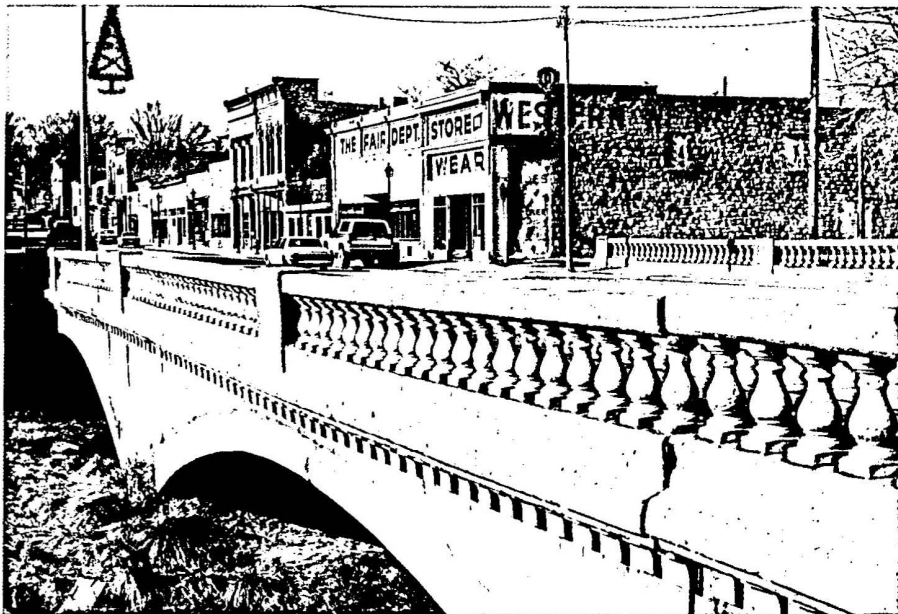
Gallinas River Bridge at Las Vegas (No. 1549)
